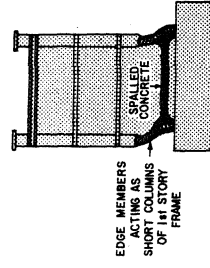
MECHANISM OF WALL FAILURE OF WALL SPECIMENS
